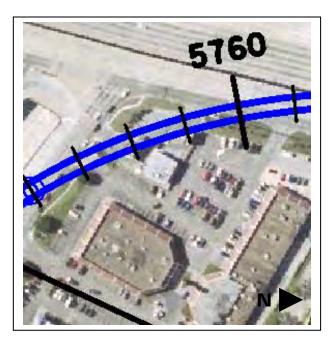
Commercial Building at Greenspoint Drive & IH-45
